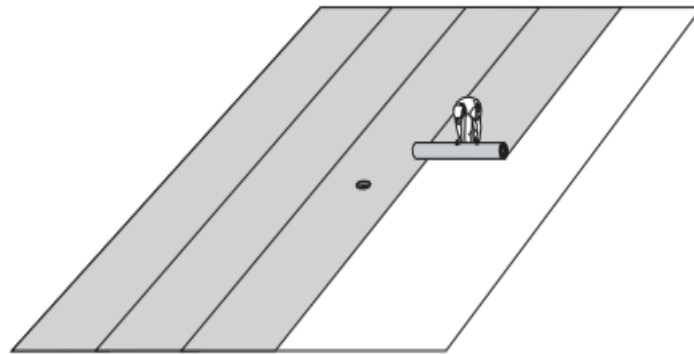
Installing water proofing, root barrier ,and protection material layers[43] .
